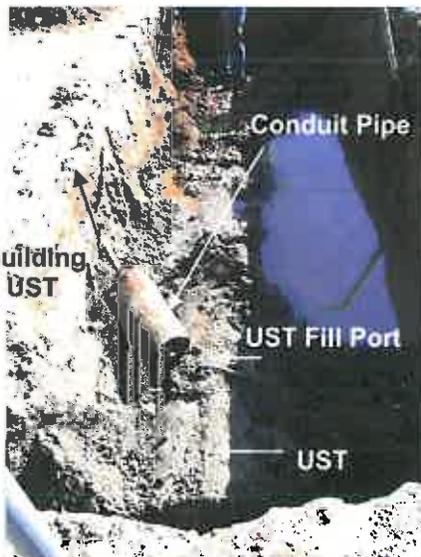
Building 161 UST fill pipe located in vault. Photo taken 1/3/2006.
